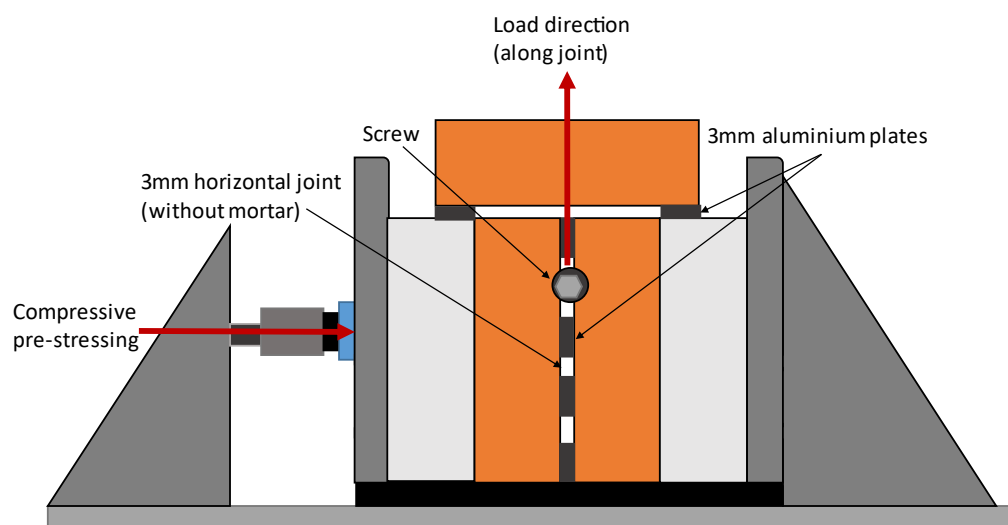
Schematic drawing of test setup for shear tests in horizontal joints (test series A2j)
